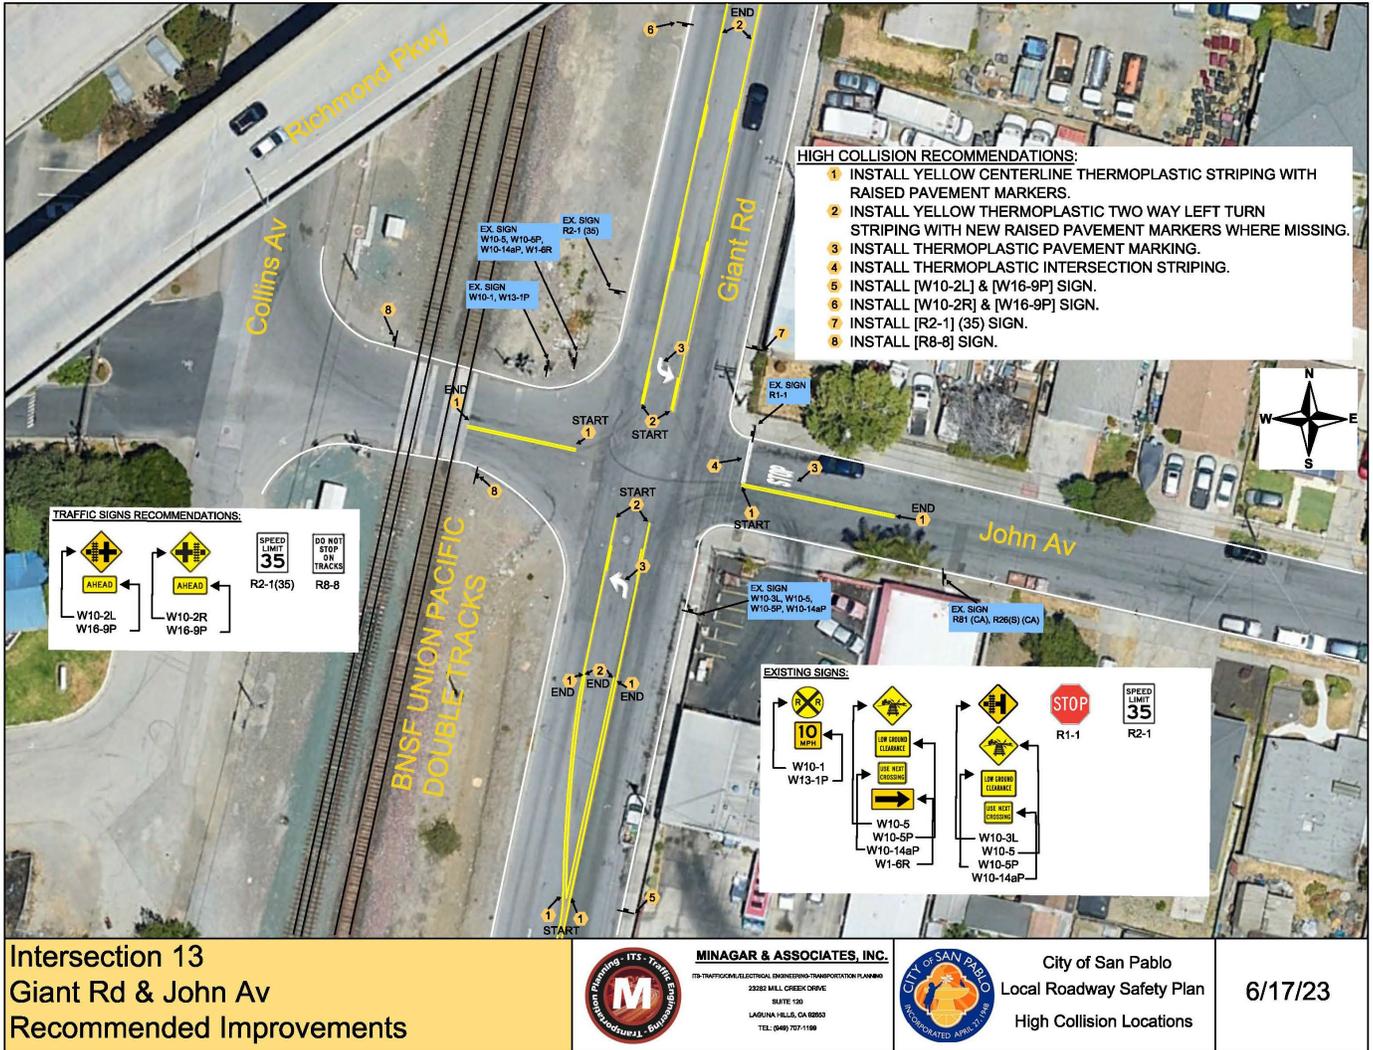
Intersection 13- Giant Rd & John Av Crash Recommended Improvements
